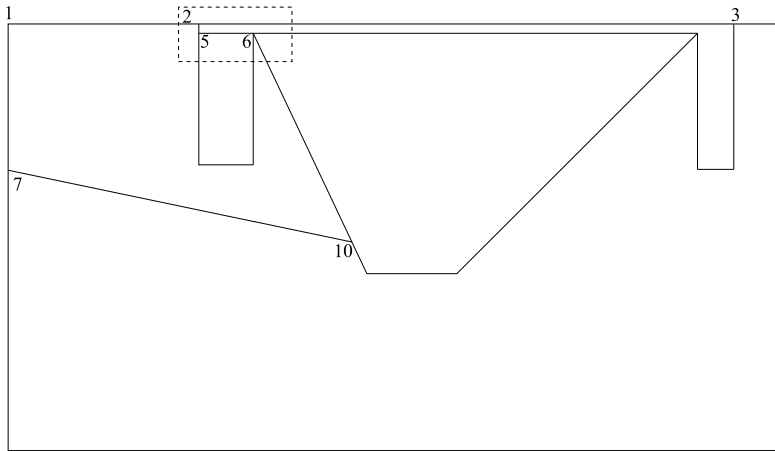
The model of the bridge on the nonstable slope, the pier situated in the moving foundation bed soil/rock.
